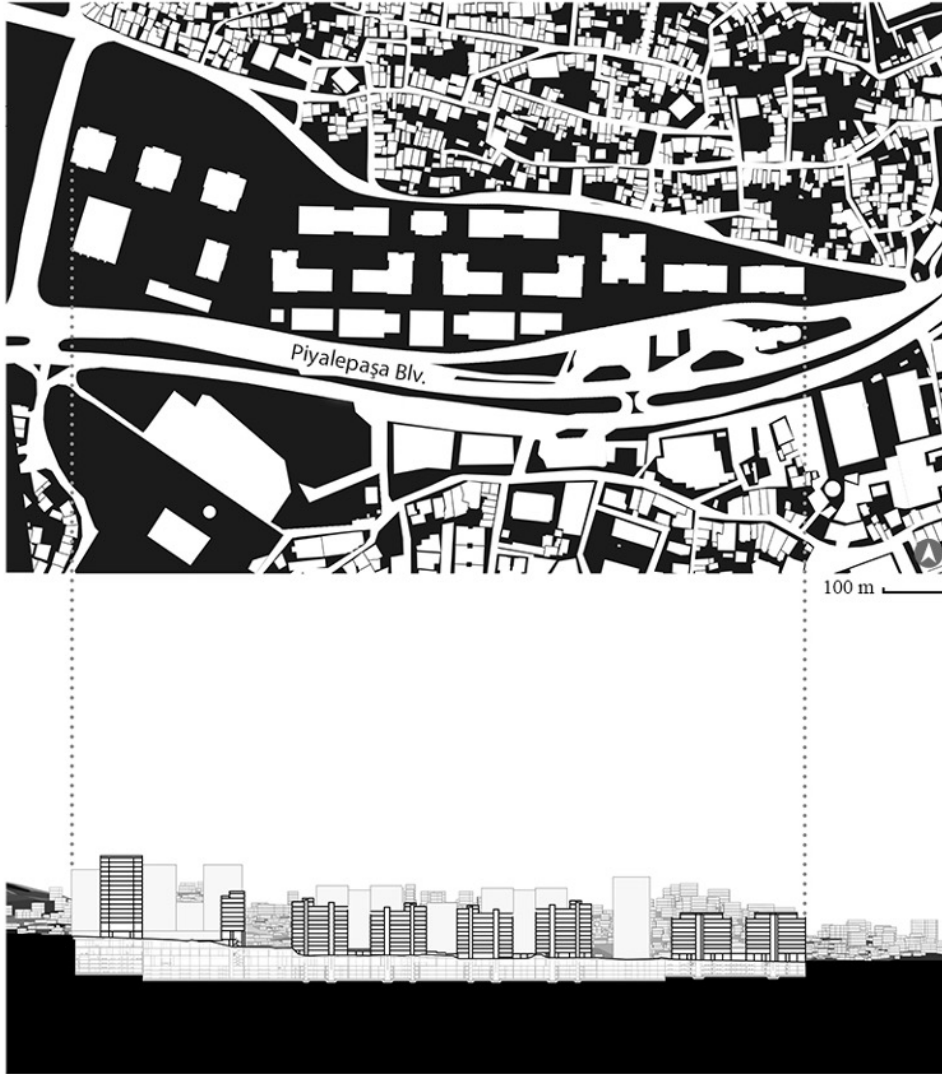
Beyoglu-Piyalepasa Project Plan, Section (IBB Activity Report 2023, Author)
